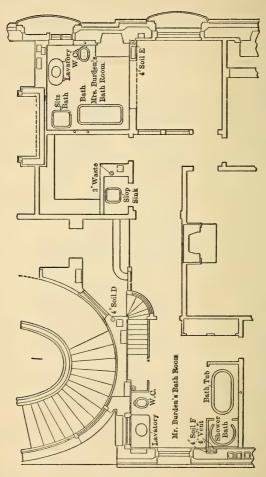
Part of Floor Plan in the Burden Residence in New York City, showing Private Bath Rooms.
